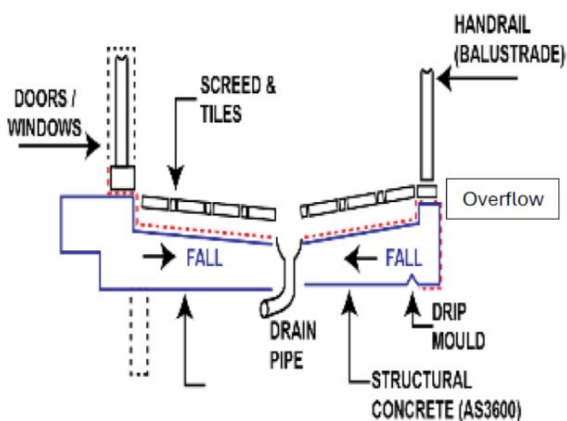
Typical concrete balcony construction details (screed and tile installation). The waterproofing membrane is per AS 4654.1, and indicated by a dotted red line (---).
